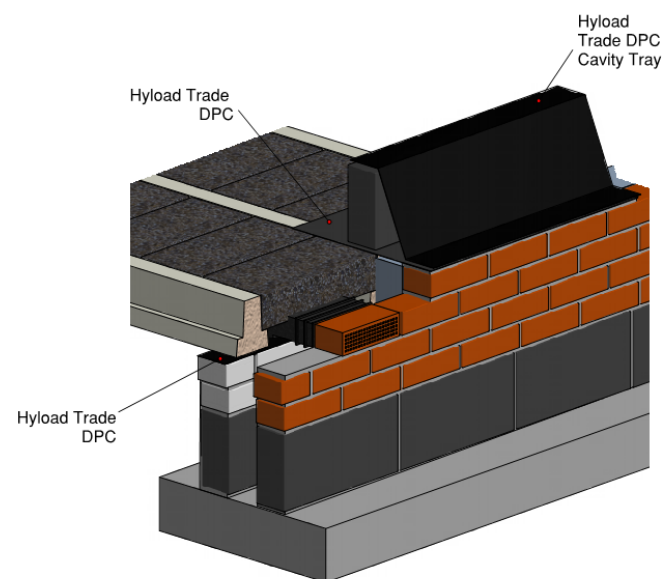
Typical Arrangement of Hyload Trade DPC at a wall base
